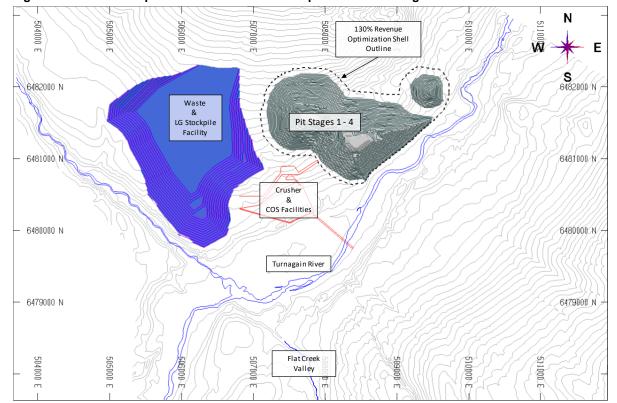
Waste Disposal & Mineralisation Stockpile General Arrangement
